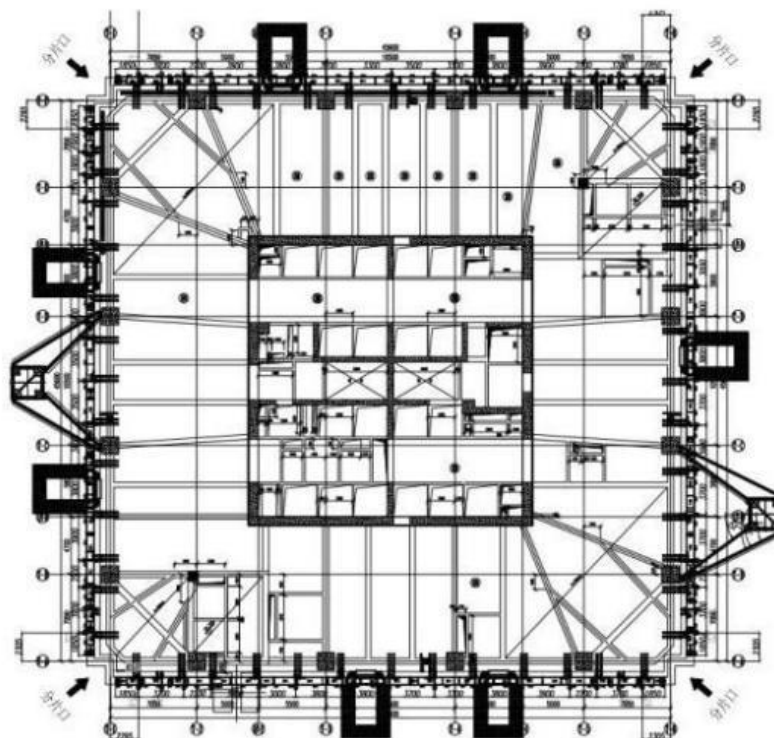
Plan Design Drawing of Attached Lifting Scaffold on the 5th Floor
